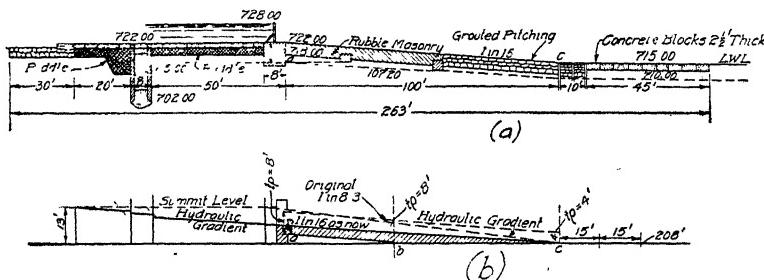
Profile of Khanki Weir, Showing Restoration Work Similar to that of Narora Weir
